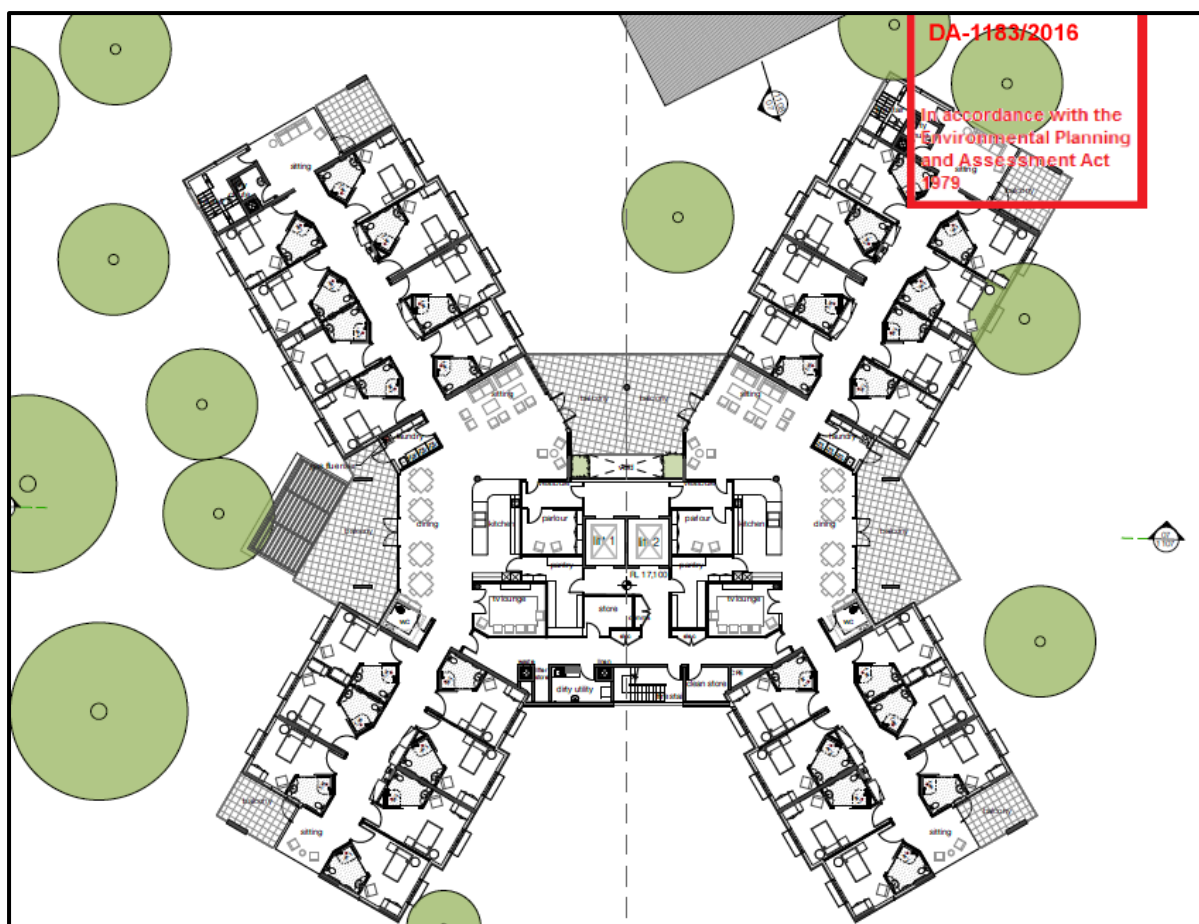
Approved B10 Second Floor Plan for DA-1183/2016
